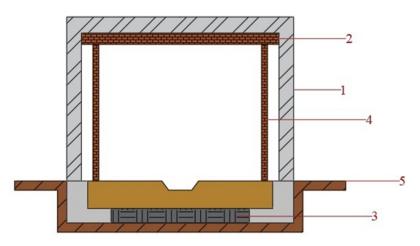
Cross-section of a masonry chamber 1) reinforced concrete, 2) burned brick, 3) stone base, 4) air space, 5) soil.
